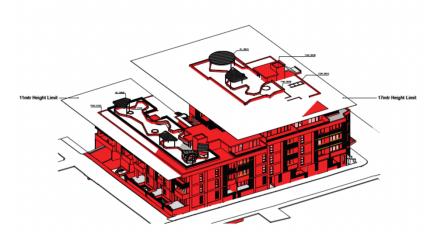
Subject site - Height Plane Overlay (Nordon Jago Architects)
